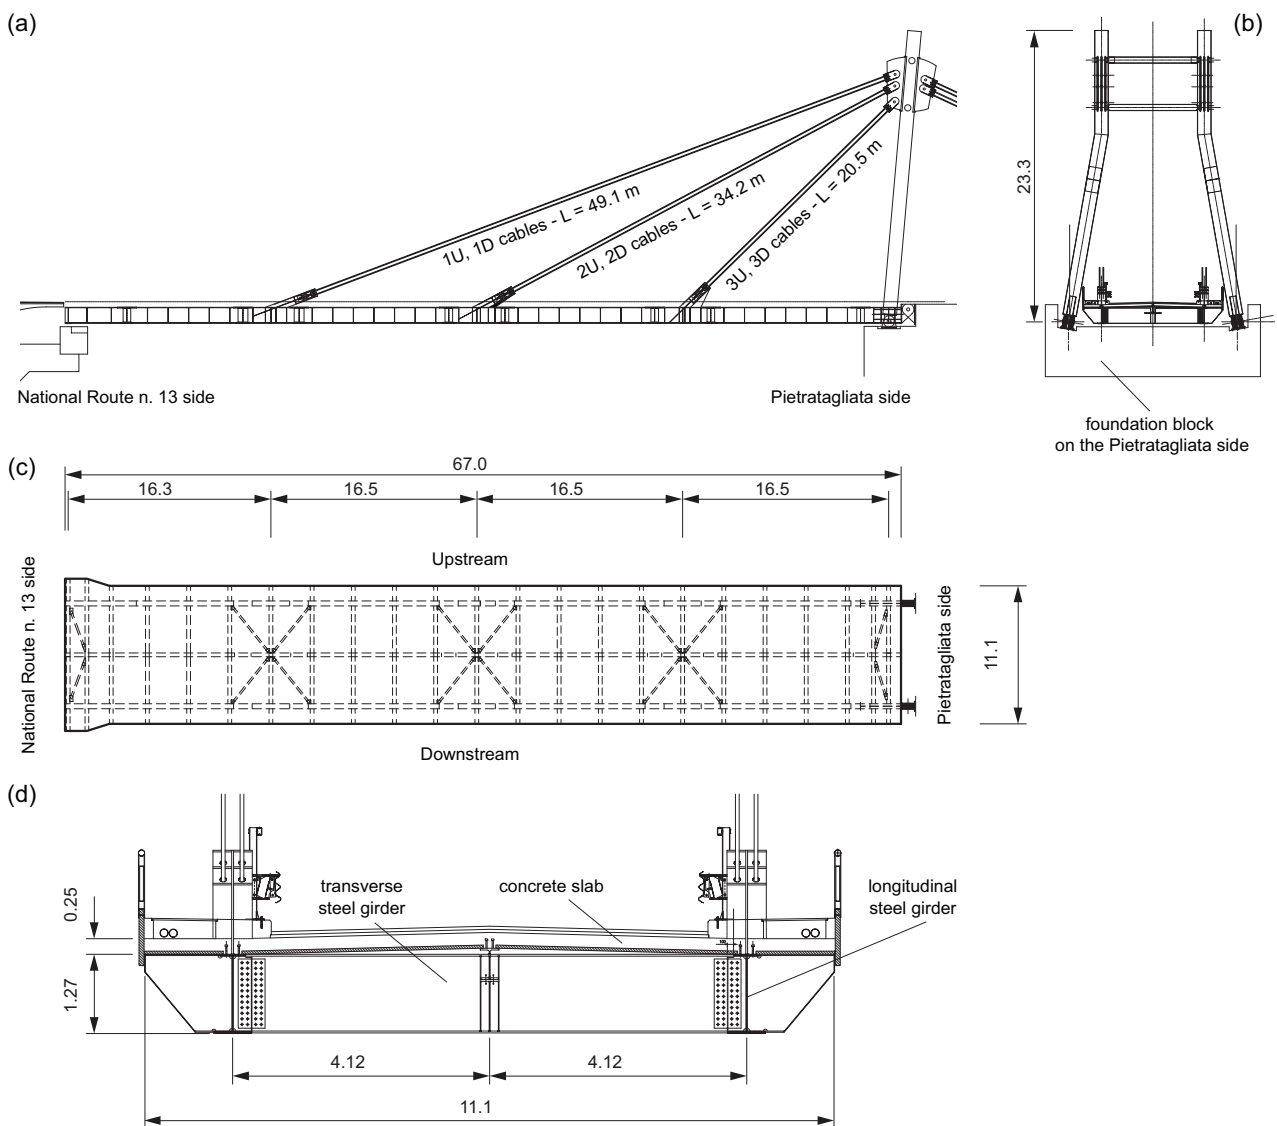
Overview of the Pietratagliata cable-stayed bridge: (a) lateral view; (b) steel tower; (c) plan view and (d) cross-section.
